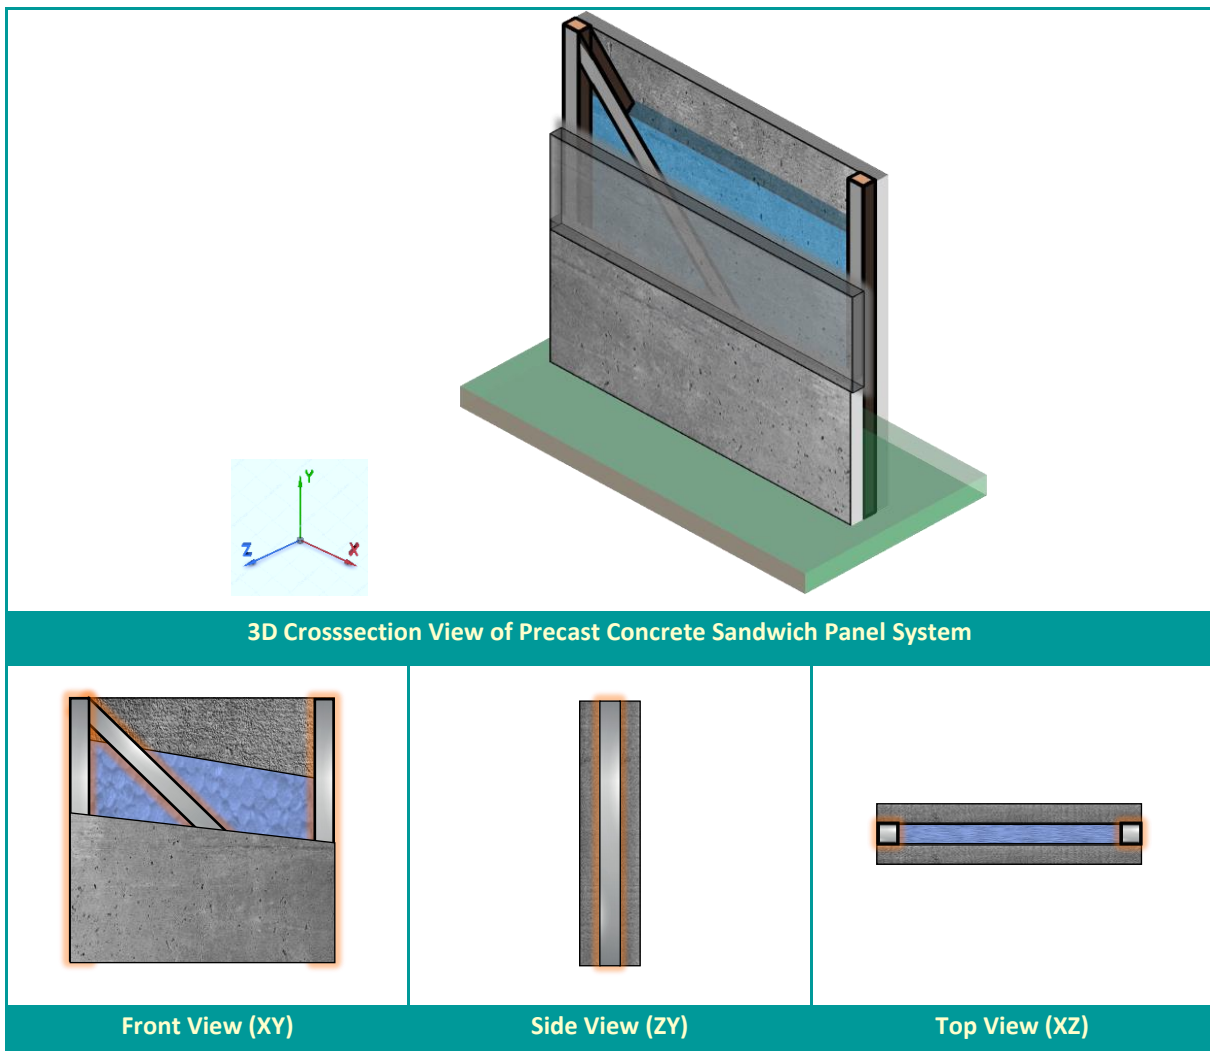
General layout and views of the developed precast concrete sandwich panel system.
